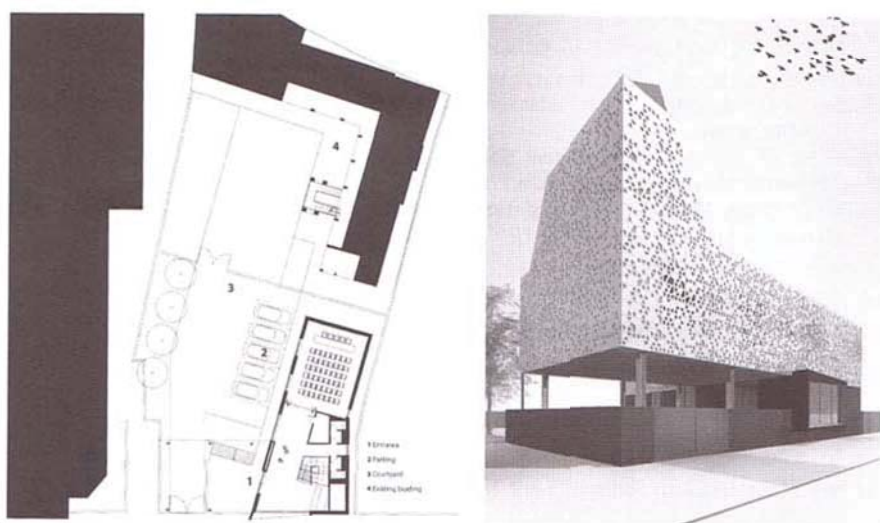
P.I.R.C. at Abdali Road: planimetric drawing view from the street
